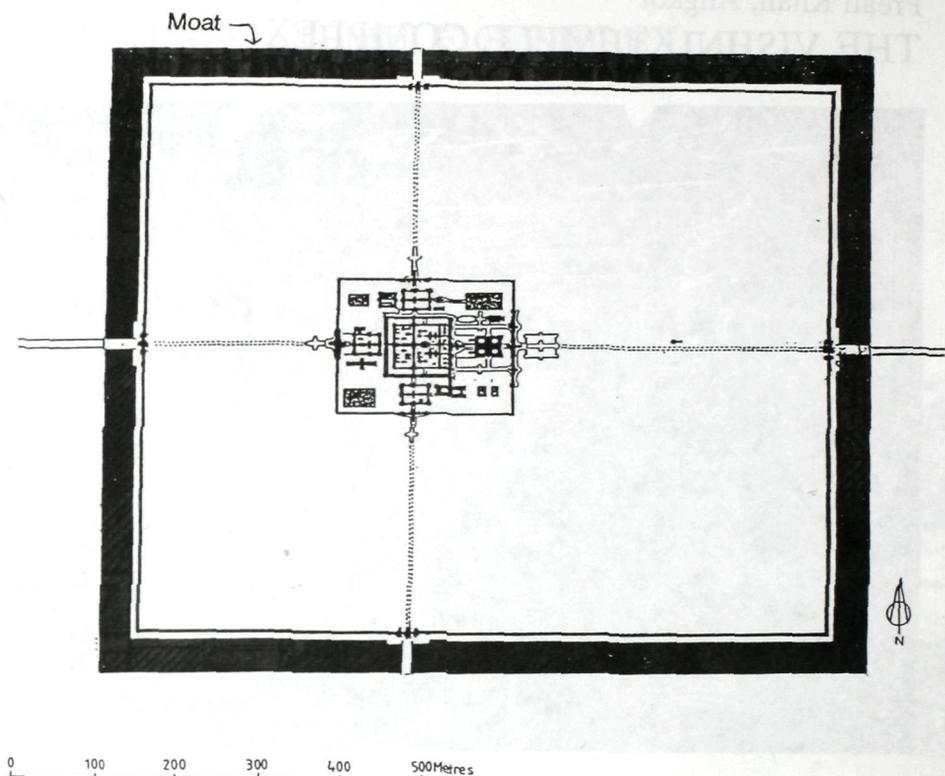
(above) Location: Plan of Preah Khan (after J Boisselier 1966).
